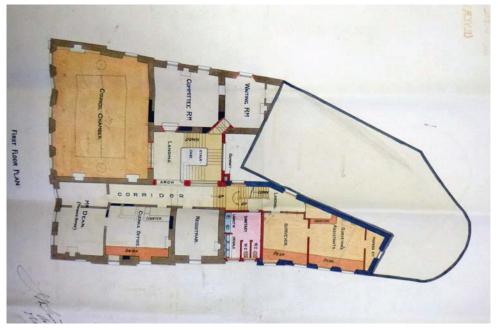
(right): First floor plan, dated 1901 (CAC(B) Z/1028/2 1901-1904)
